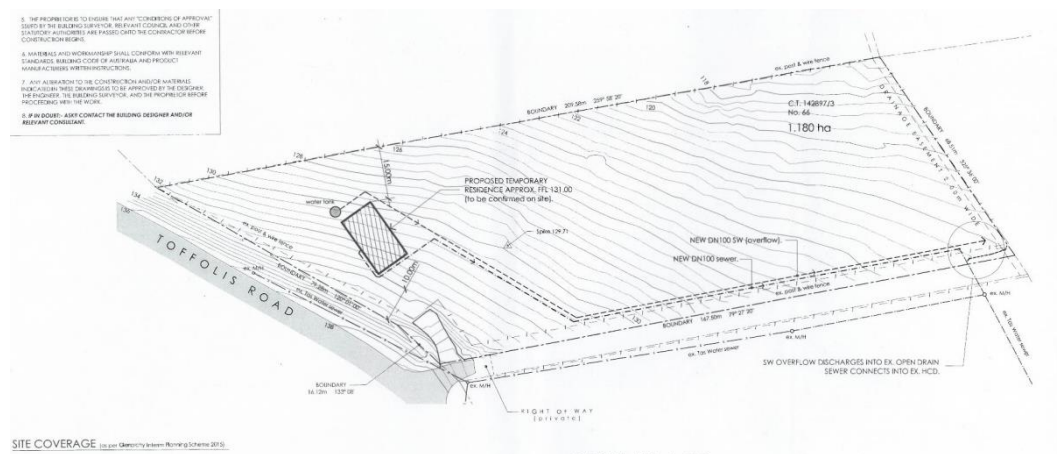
Site Plan of 66 Toffolis Road, Claremont.
